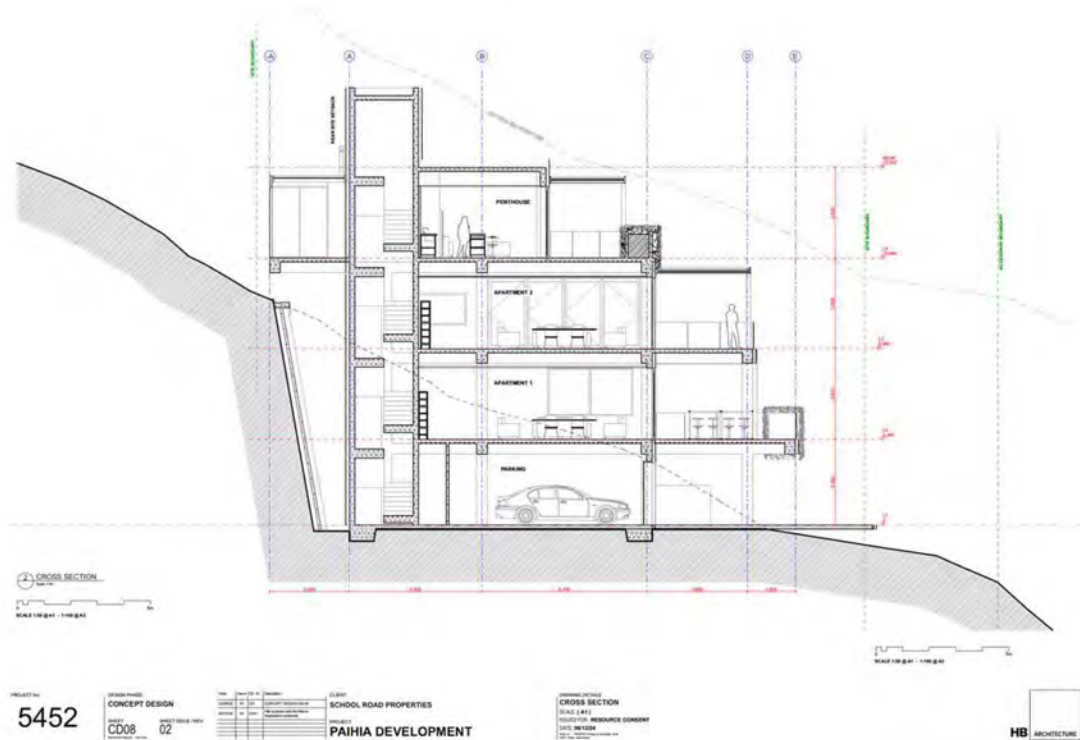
Apartment Cross Section (Source: HB Architecture)
